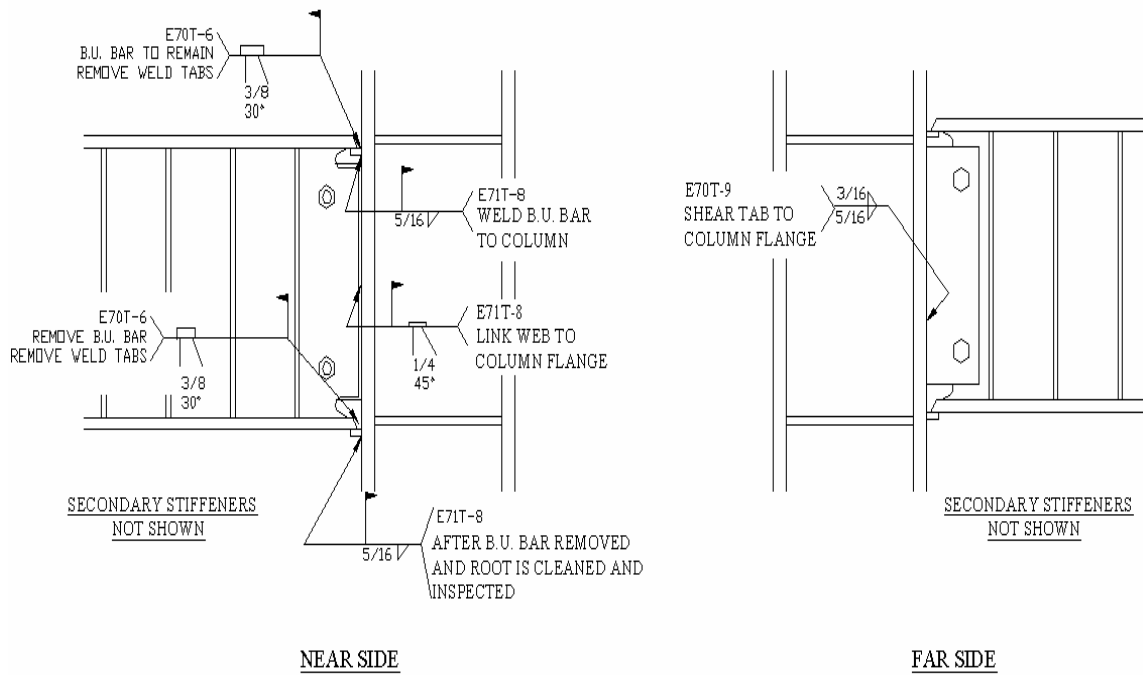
Specimens AISC-5 & 8 – Connection Details
